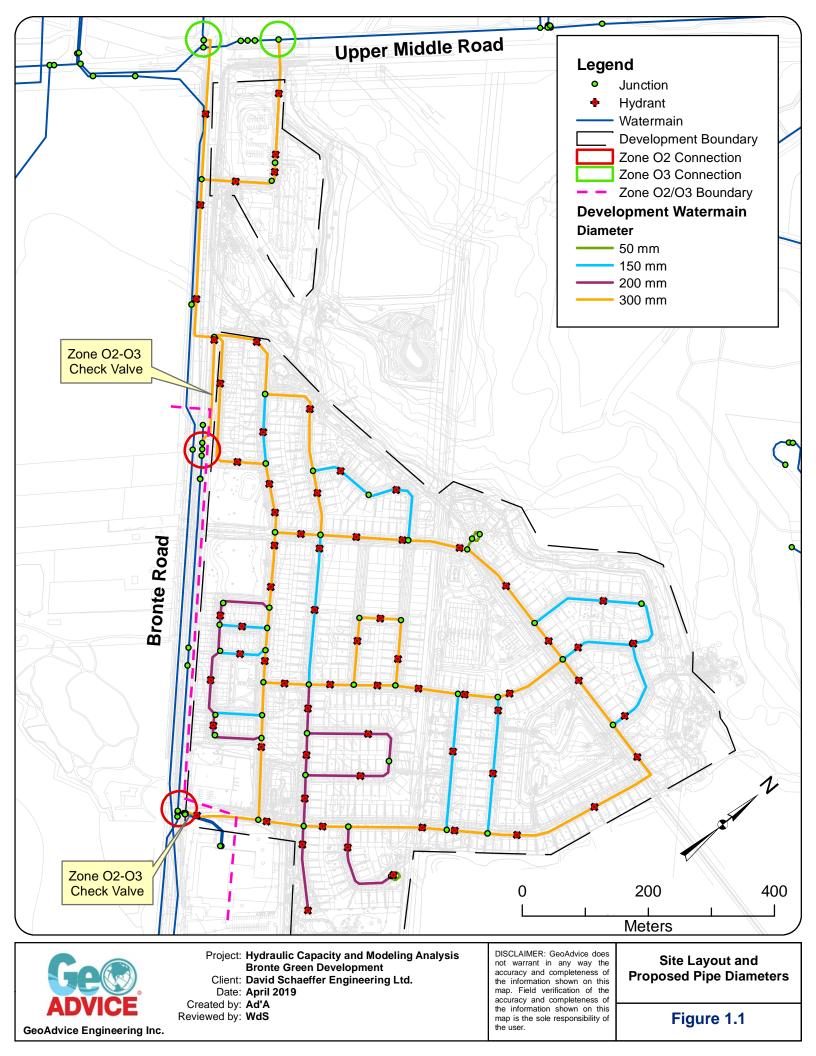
illustrates the proposed network layout, as well as the connection points and proposed pipe diameters. There are four (4) proposed connections to the Region's existing water main network:
